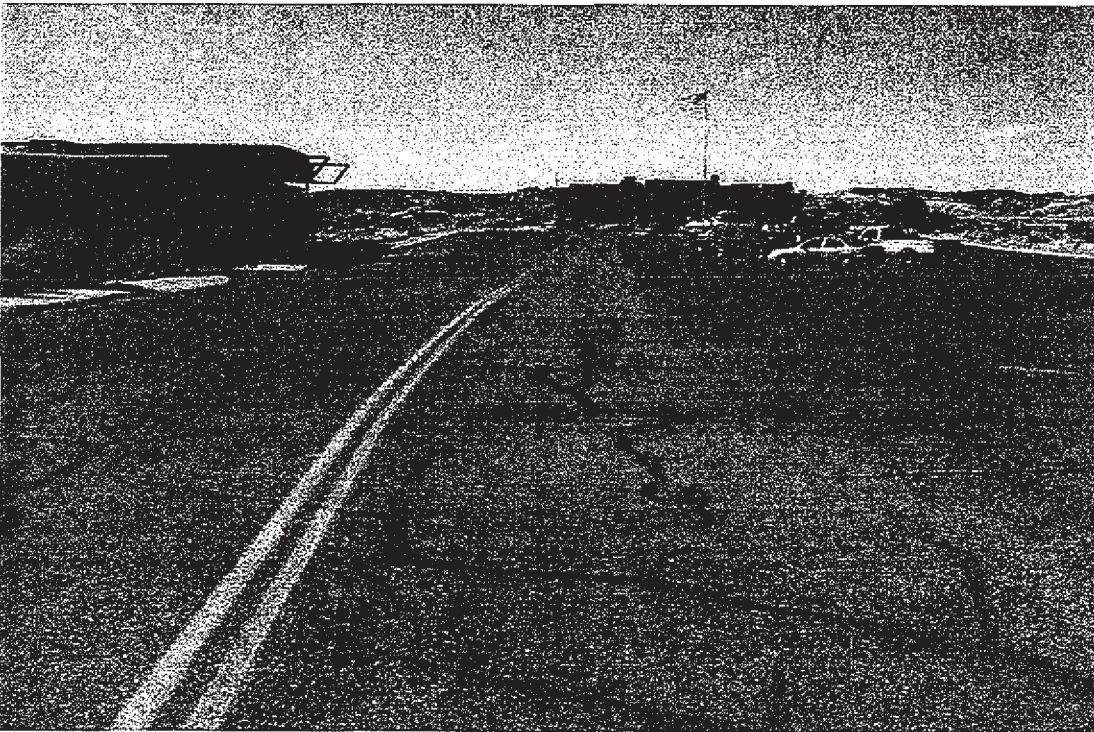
MP 26.40 - South Area Parking, Typical Pavement Section
